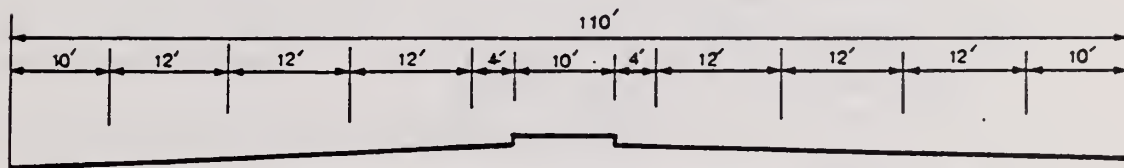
shows typical cross-sections under the existing conditions and the two widening alternatives. Presently Route 9 is 70 ft. to 76 ft. wide with 9 ft. shoulders and a variable 28 to 6 ft. median. Under the two widening schemes the total right-of-way will increase to 110 ft. and 134 ft. respectively. Both designs require a significant amount of land. The value of this land would be difficult to estimate accurately at this level of analysis. However, a conservative estimate for the approximately 17.3 mile length of Route 9 in MetroWest is \$40 million for 6-lanes and \$60 million for the 8-lane design. Construction costs are shown in Table 2.
